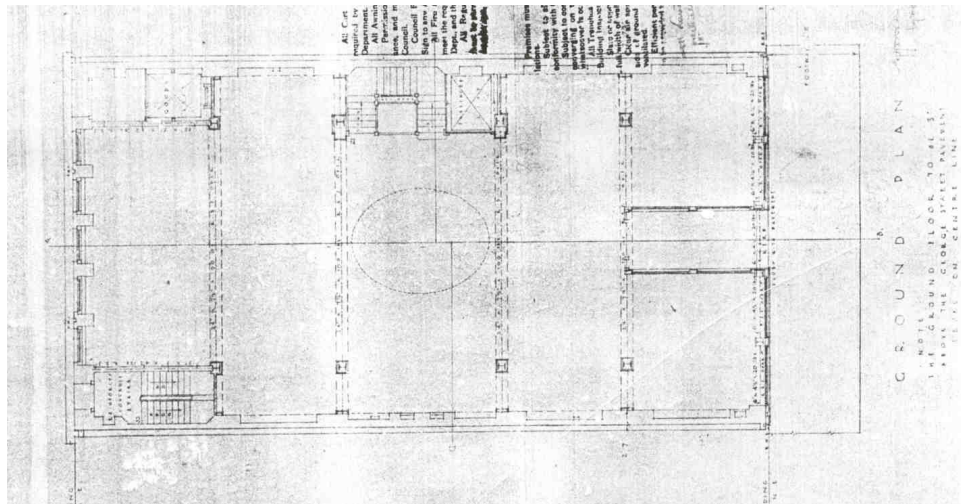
Ground floor plan by Wilson, Neave and Berry, 1922 (Source: City of Sydney Archives, BA 74/22)
